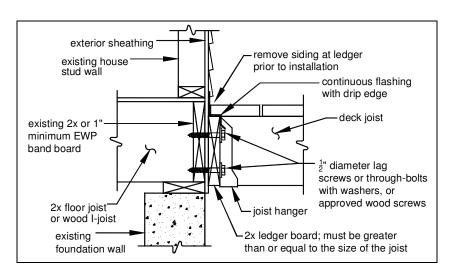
ATTACHMENT OF LEDGER BOARD-TO-BAND BOARD
